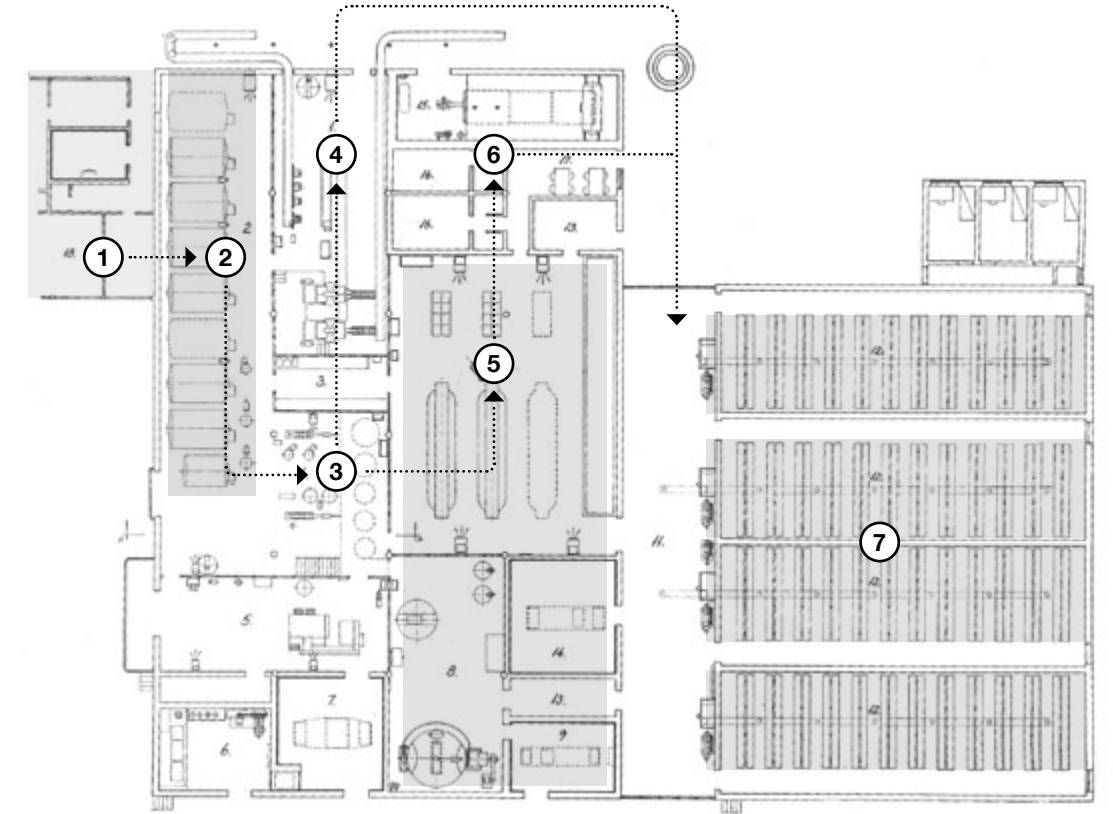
Example of a typical dairy processing plant (Petersen: 1963)
